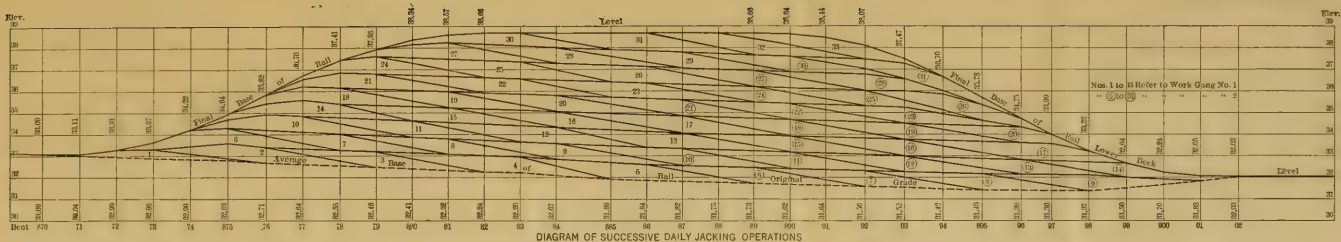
RAISING STRUCTURE IN SECOND AVENUE WITH HYDRAULIC JACKS.
